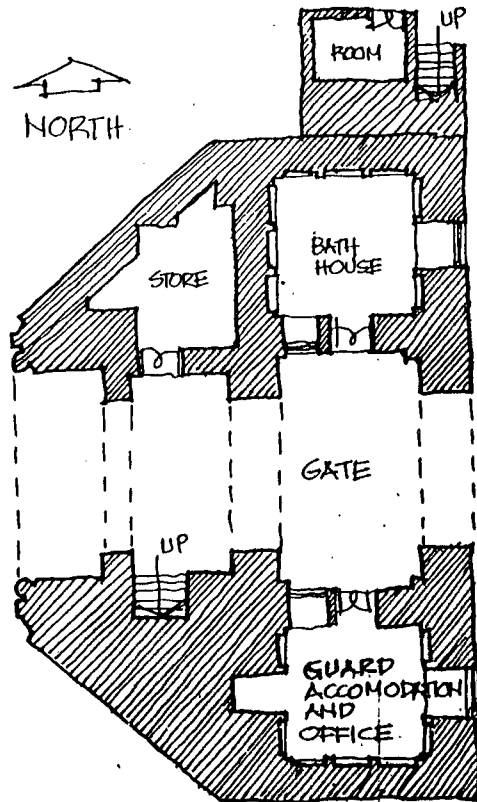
Ground floor plan, Neemtali gate
